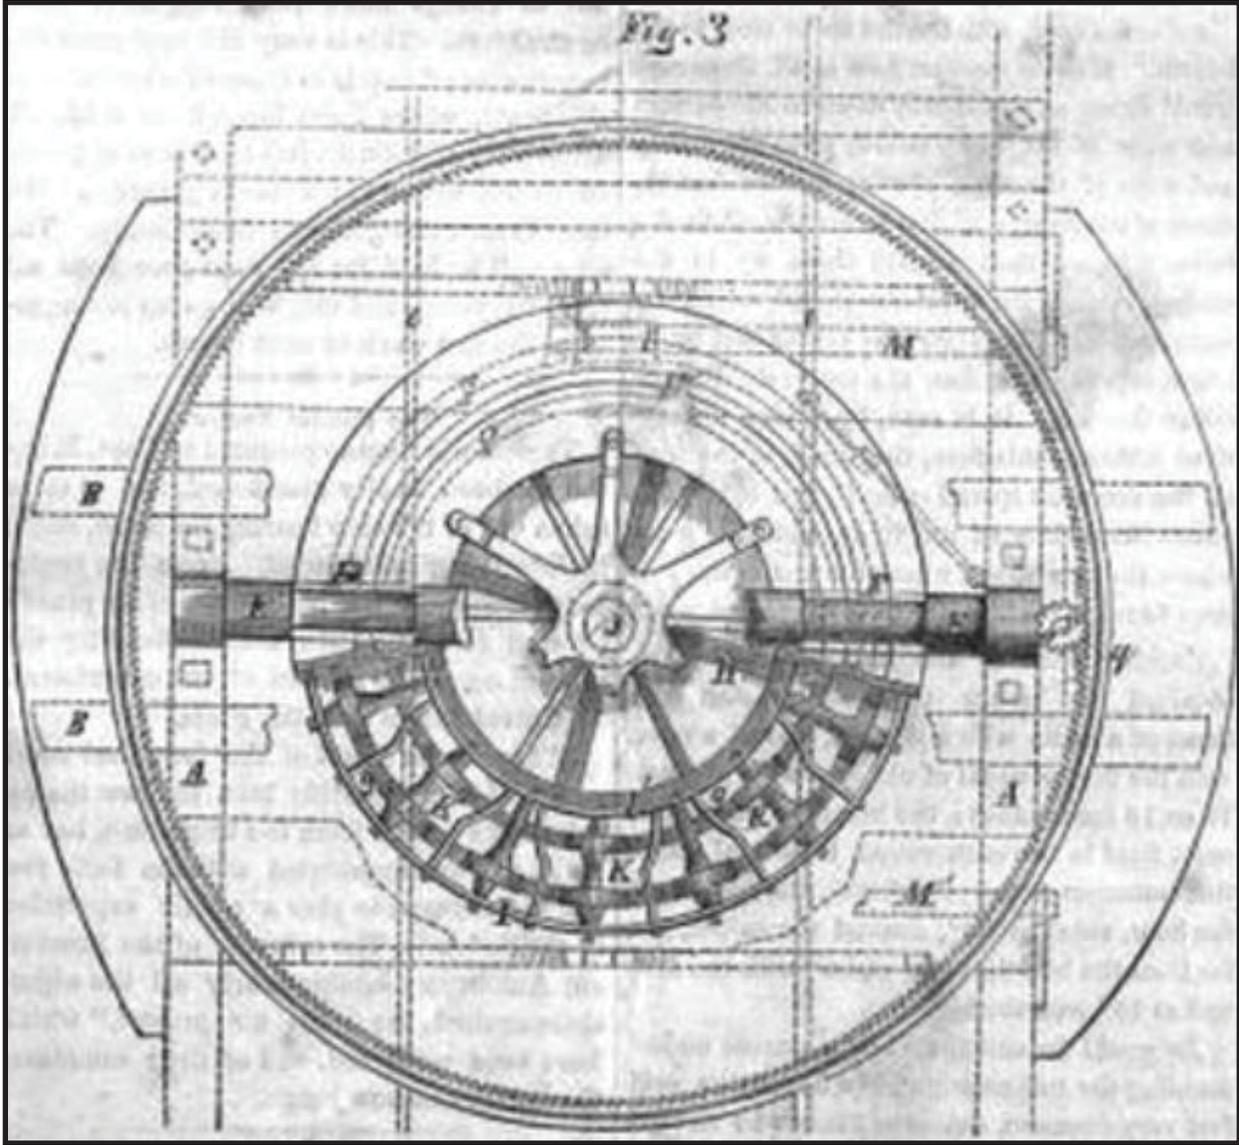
Robie's Balance Turn-Table. Plan View of Central Pivot Area. 1854. Note the width of the rail beneath the circular carriage atop the pivot is standard gauge (4 feet 8.5 inches).
